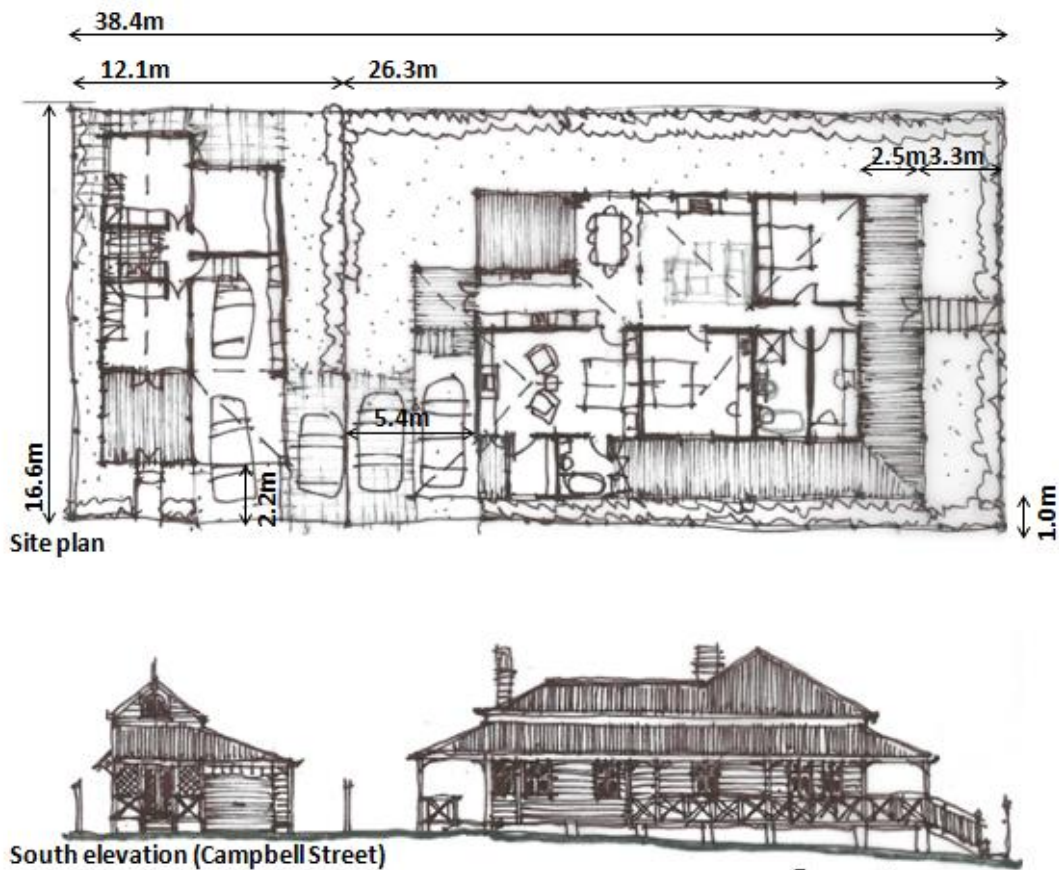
Site and streetscape analysis of 121 Mort Street, Toowoomba¹⁰
